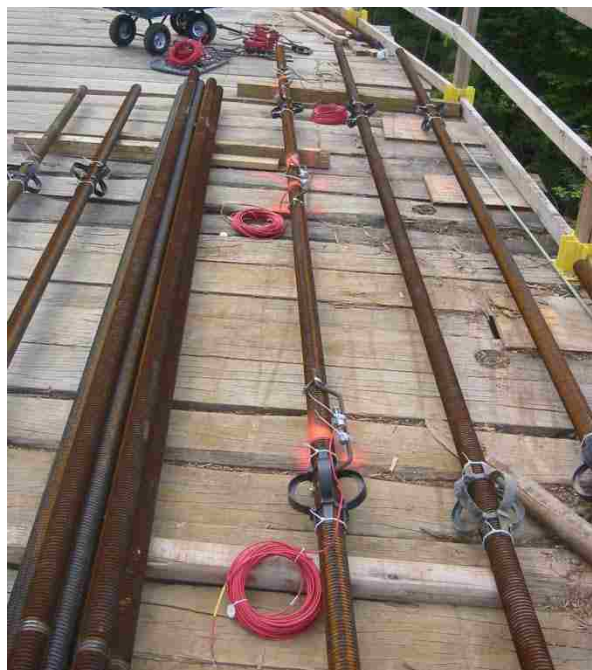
Photograph of Instrumented Central Reinforcing Bar (Step 3)
